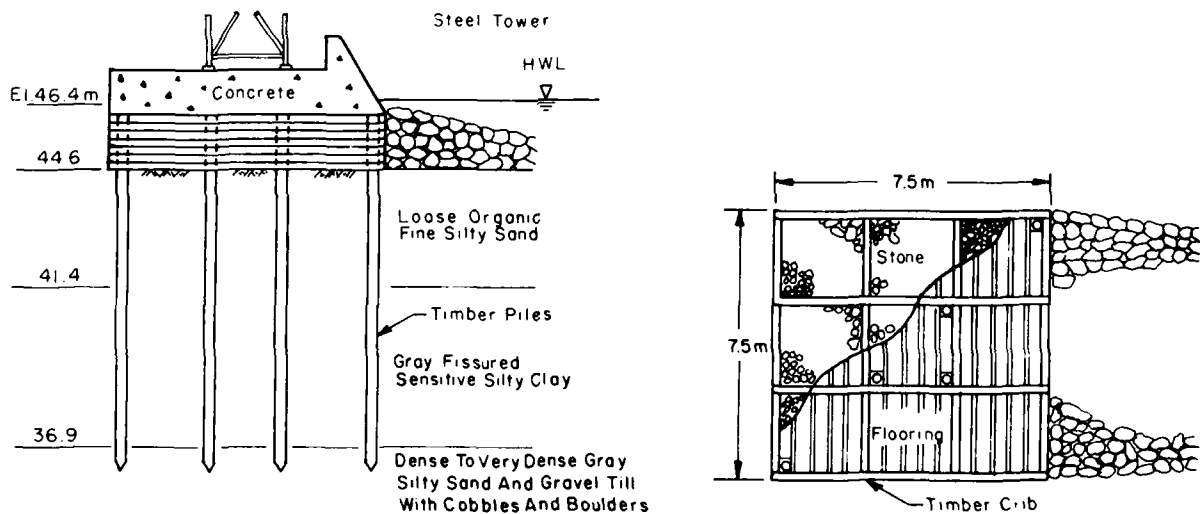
Stone-filled timber cribs and concrete caps used as light tower bases.
